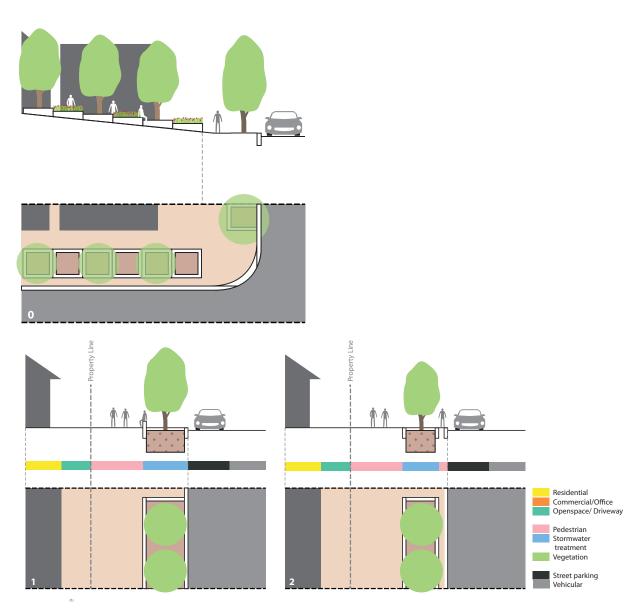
Examples of Green Street practice: 0. Green Street on slope with planter type cascades; 1. Green Street with wider sidewalk and seat wall; 2. Green Street with wider sidewalk and landing space for street parking;
